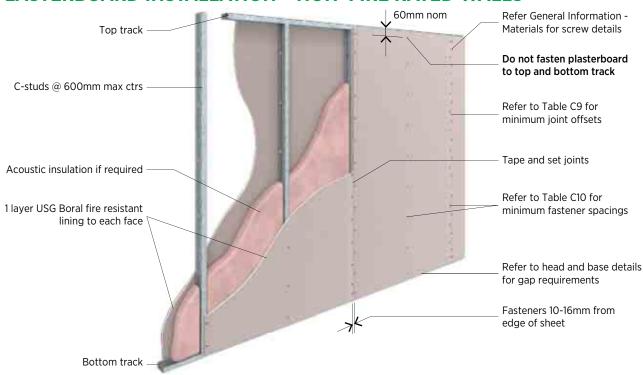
Non-Fire Rated Steel Stud - Vertical Fixing - Single Layer (fully screw fixed)
